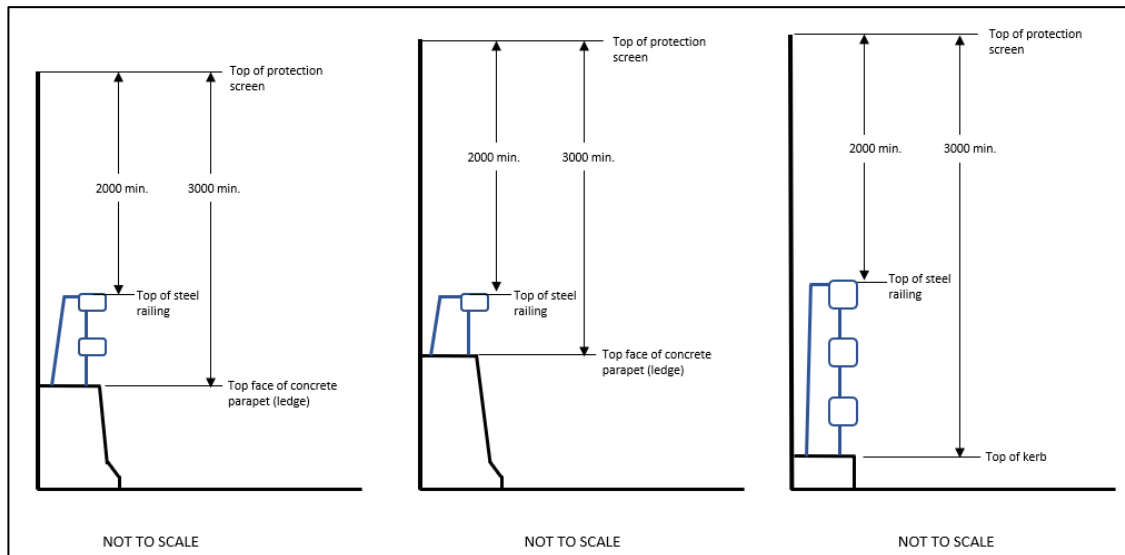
Minimum height of protection screen from top of railing or concrete parapet or kerb
